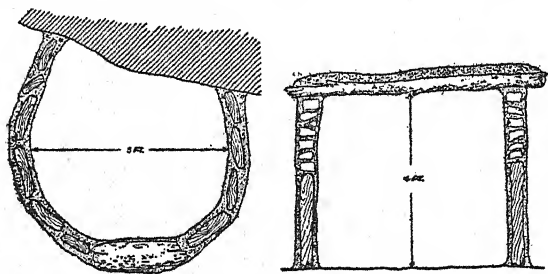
Granary in Cliff Ruin 13, Sapillo Creek. Plan and section with dimensions; walls of wooden slabs set in adobe with upper course laid with flat stones and adobe; heavy coating of adobe over roof poles; wooden slab for door sill.
